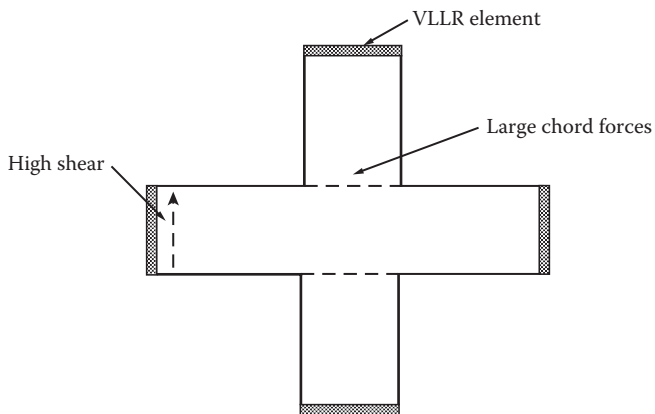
High shear and chord forces in a reentrant plan form.
